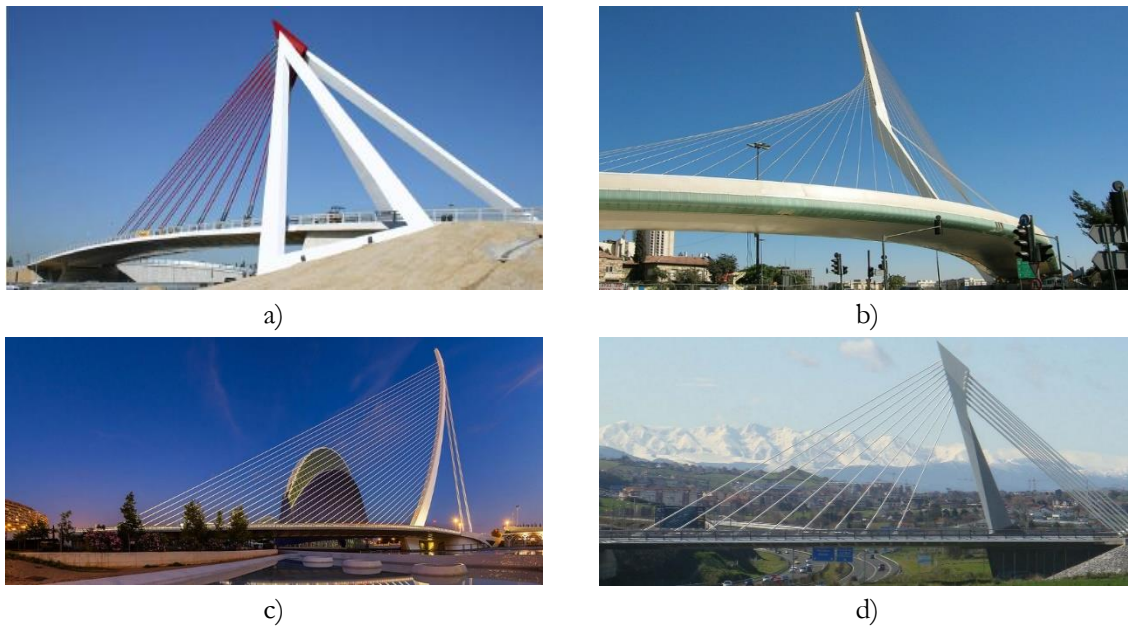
Cable-stayed bridges: a) “Puerta de las Rosas” Bridge; b) Bridge of Strings; c) “Serreria” Bridge; and d) PCICAN Access Bridge (see reference in [Table 2.1](#))
